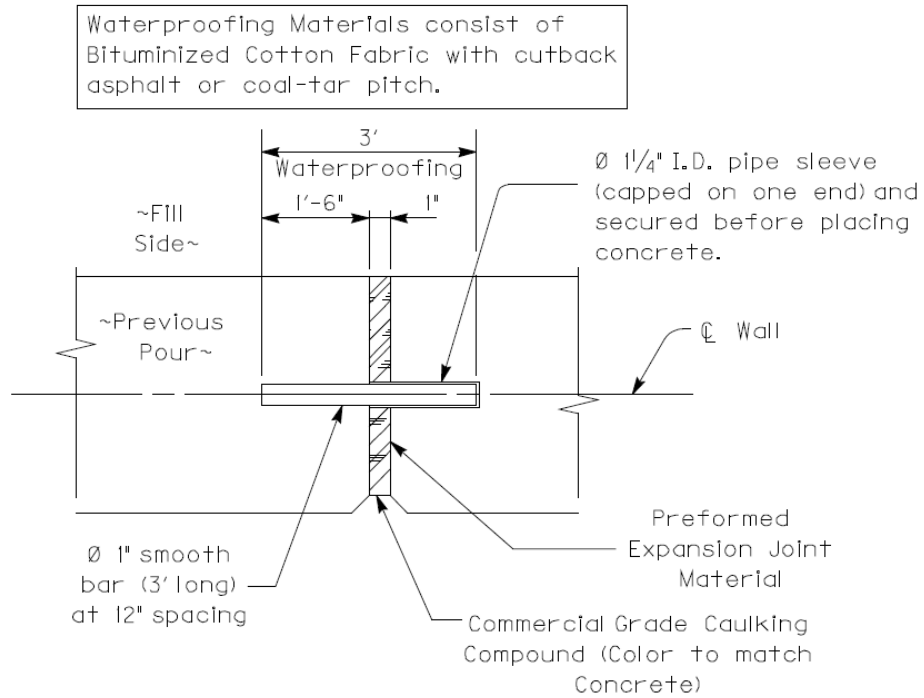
KYTC Wall Expansion Joint Detail (KYTC 2005)
